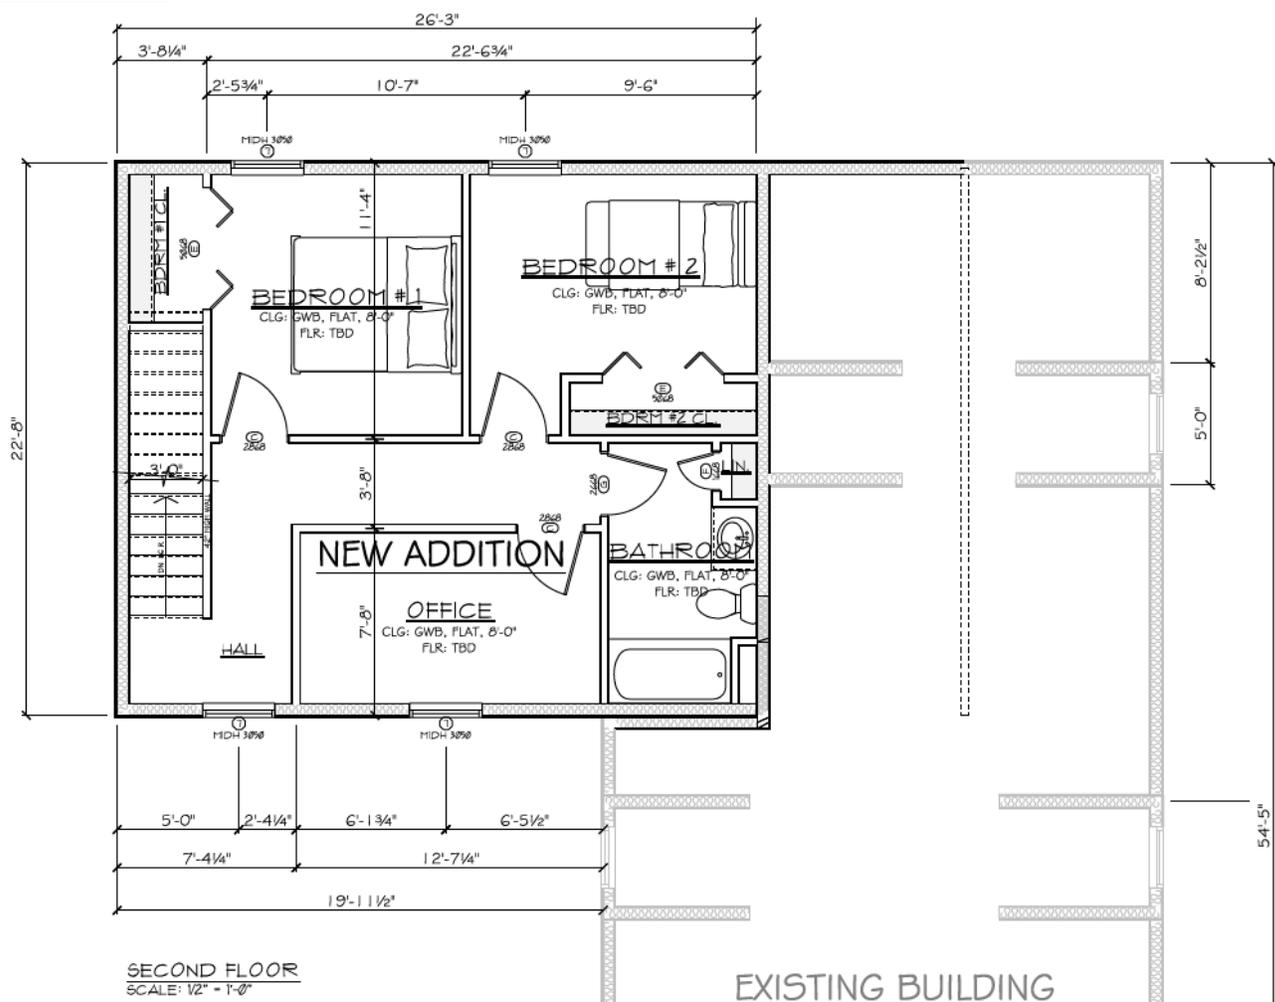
EXHIBIT A. Detailed professionally constructed architectural CADs: FP5
